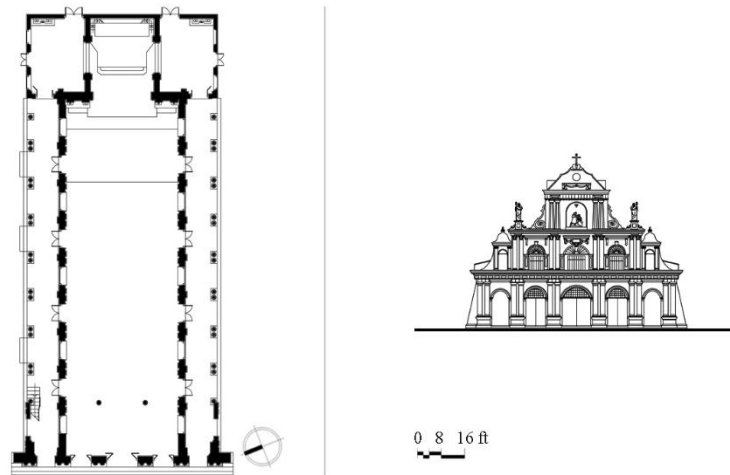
Floor plan and main façade of St. John the Baptist Church, Mutwal
